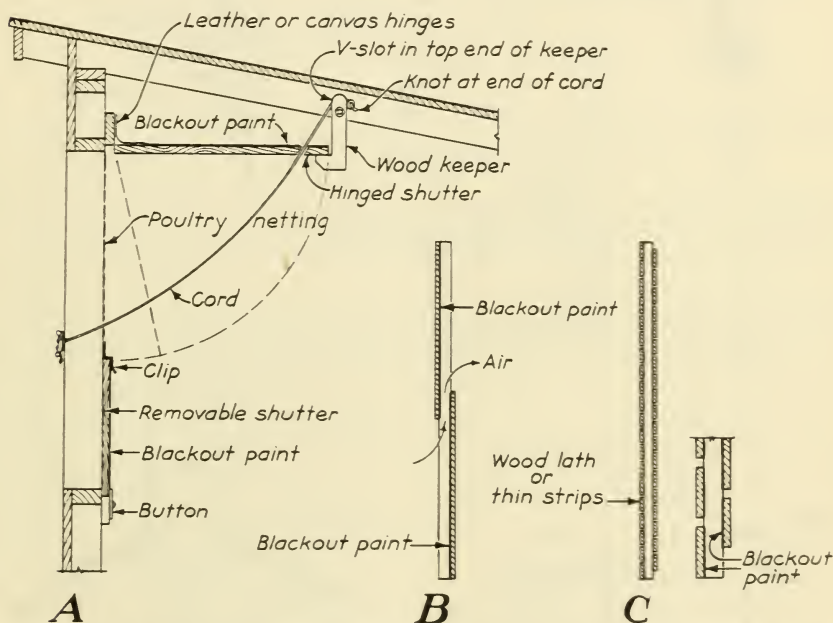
A, Hinged blackout screen which may be closed from the outside and removable ventilating shutter for poultry houses. B, removable slatted screen; C, a removable blackout ventilating screen;
